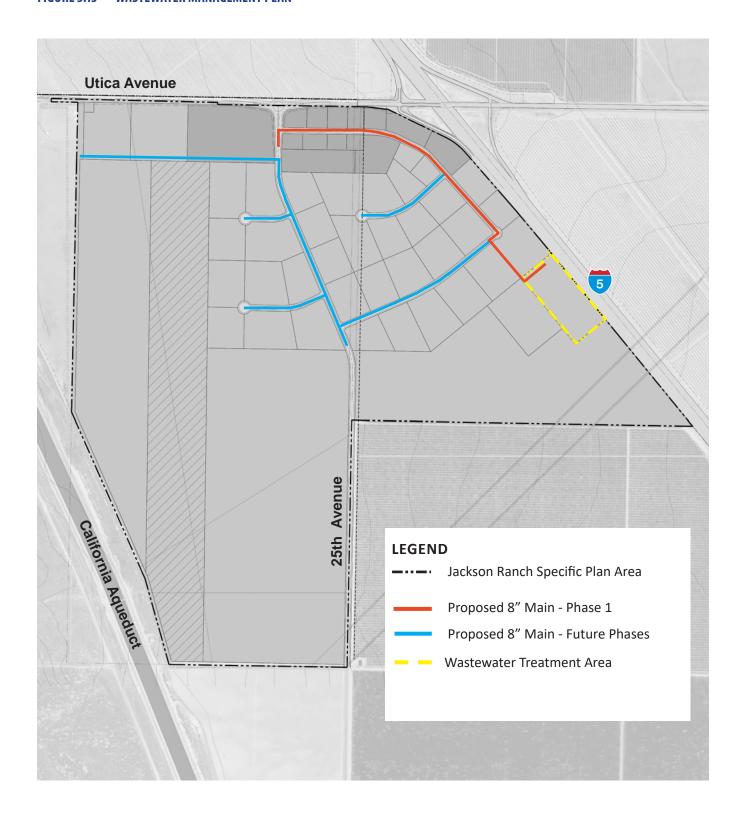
WASTEWATER MANAGEMENT PLAN
